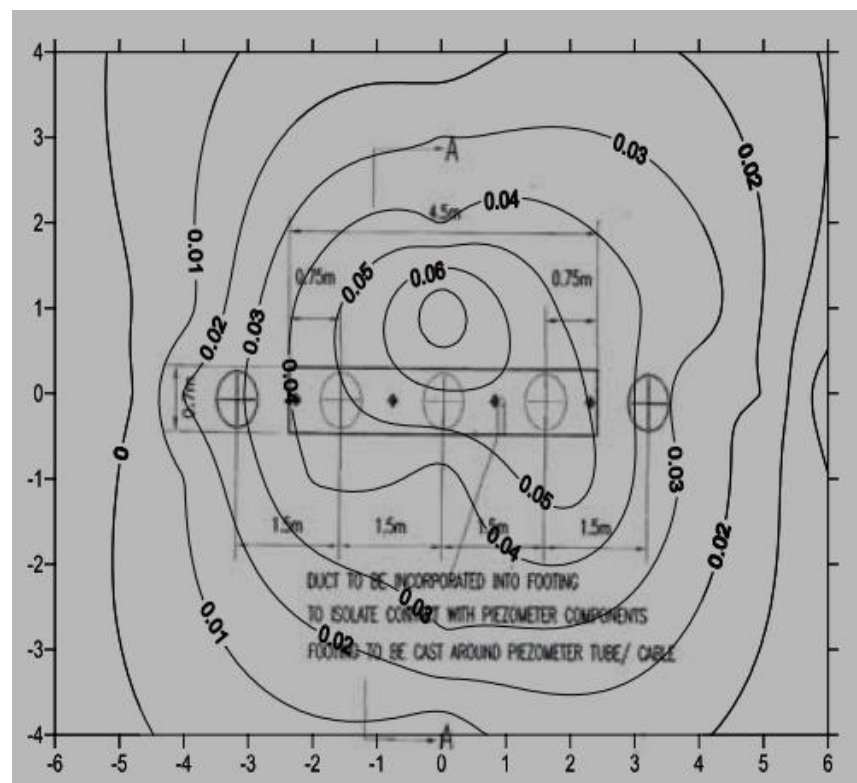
Contours of heave around a line of stone columns (after Egan, 2008)
